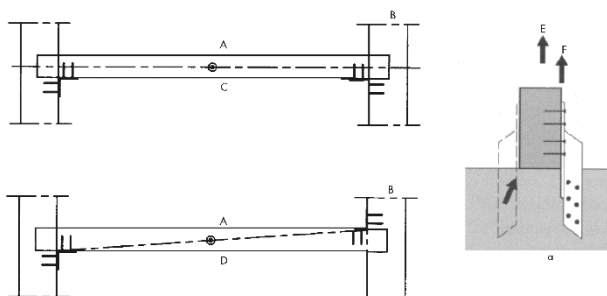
Anchoring of a purlin by means of purlin anchors and nails
